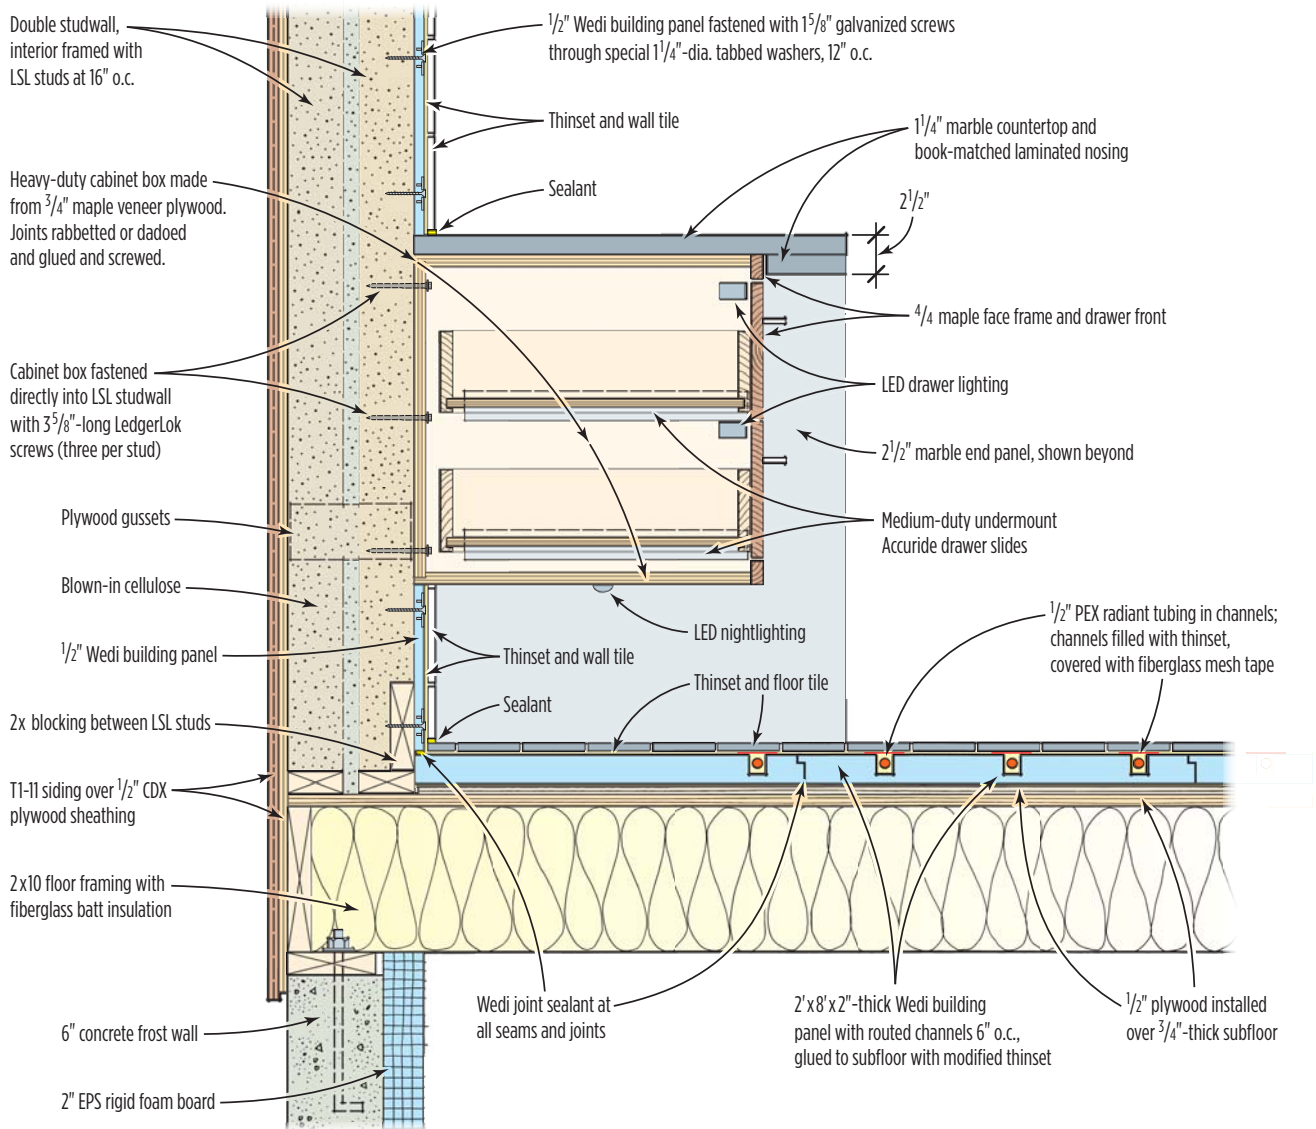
The beefy vanity cabinet was built as a single unit using $\frac{3}{4}$ -inch plywood throughout. It's fastened directly to the wall framing with structural screws. Interior partitions made of double layers of plywood add lateral support to the carcass.
